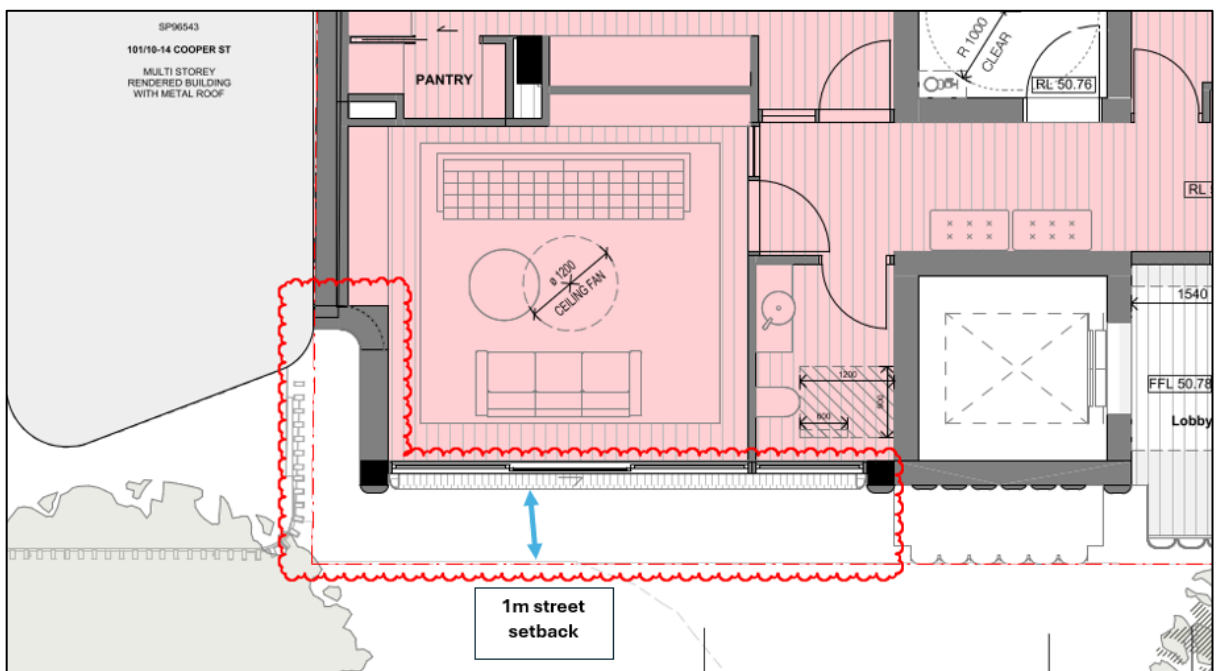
South-western corner of the typical Levels 4-6 floor plan showing splayed interface to No.10-14 Cooper Street
